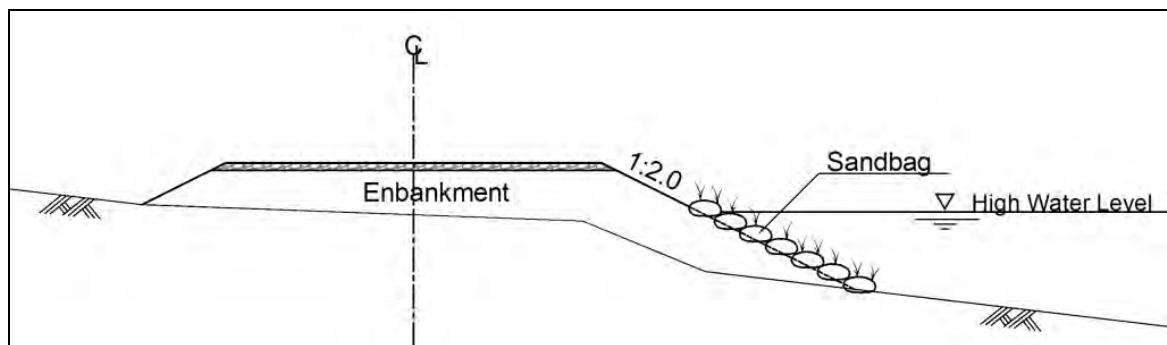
Conceptual Drawing of Sandbag Slope Protection
